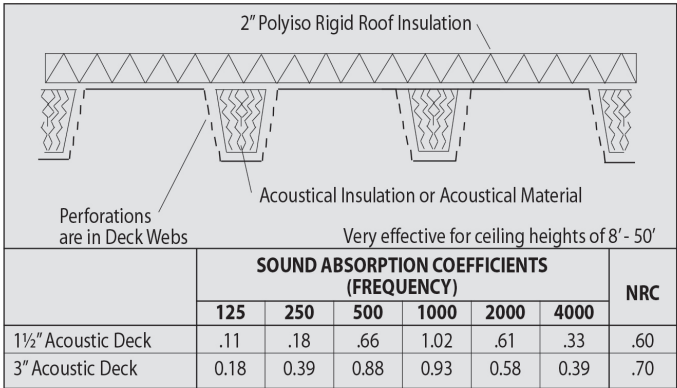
F - TYPICAL CELLULAR ACOUSTIC ROOF DECK
